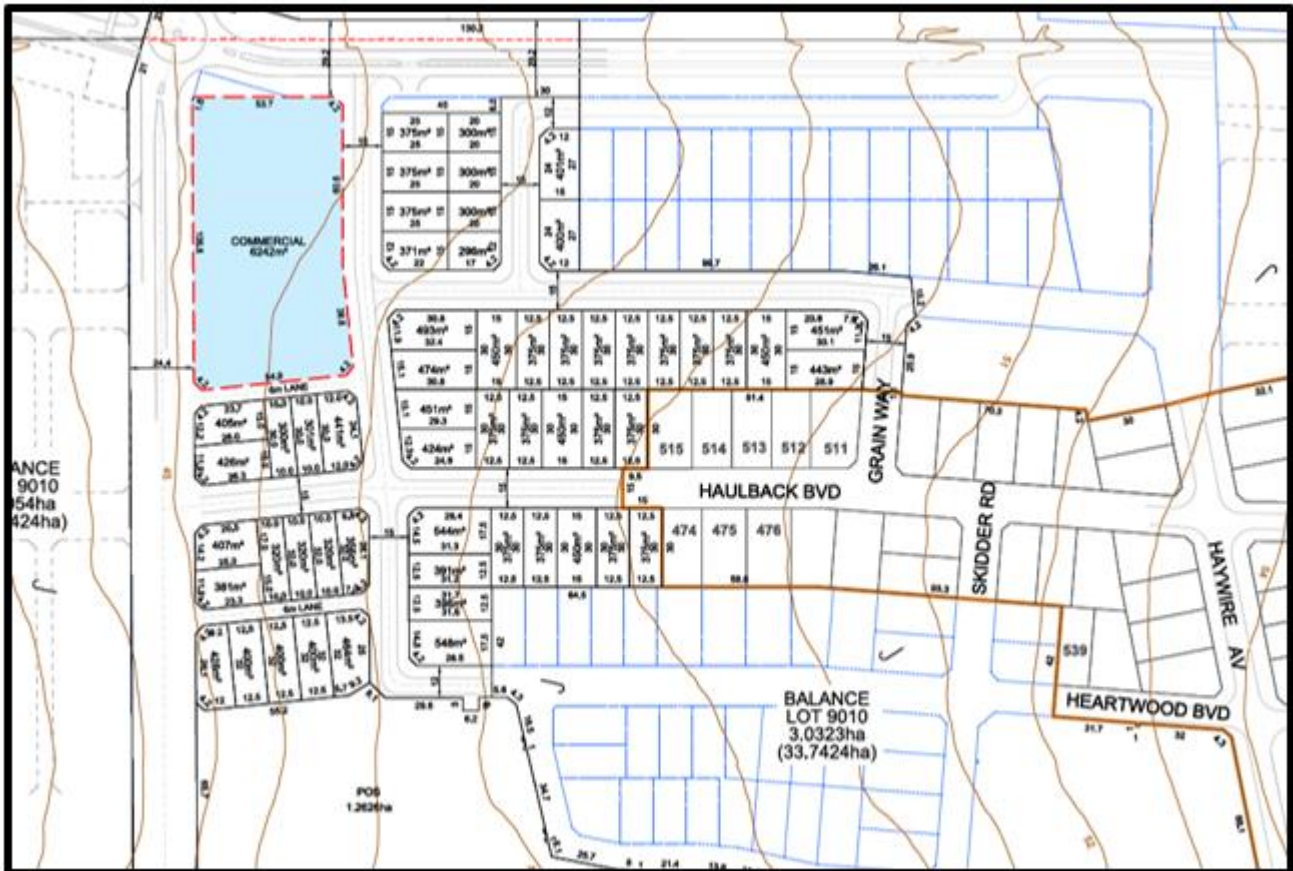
Amended subdivision plan, with amalgamated lots proposed in the north west corner (shaded blue)
